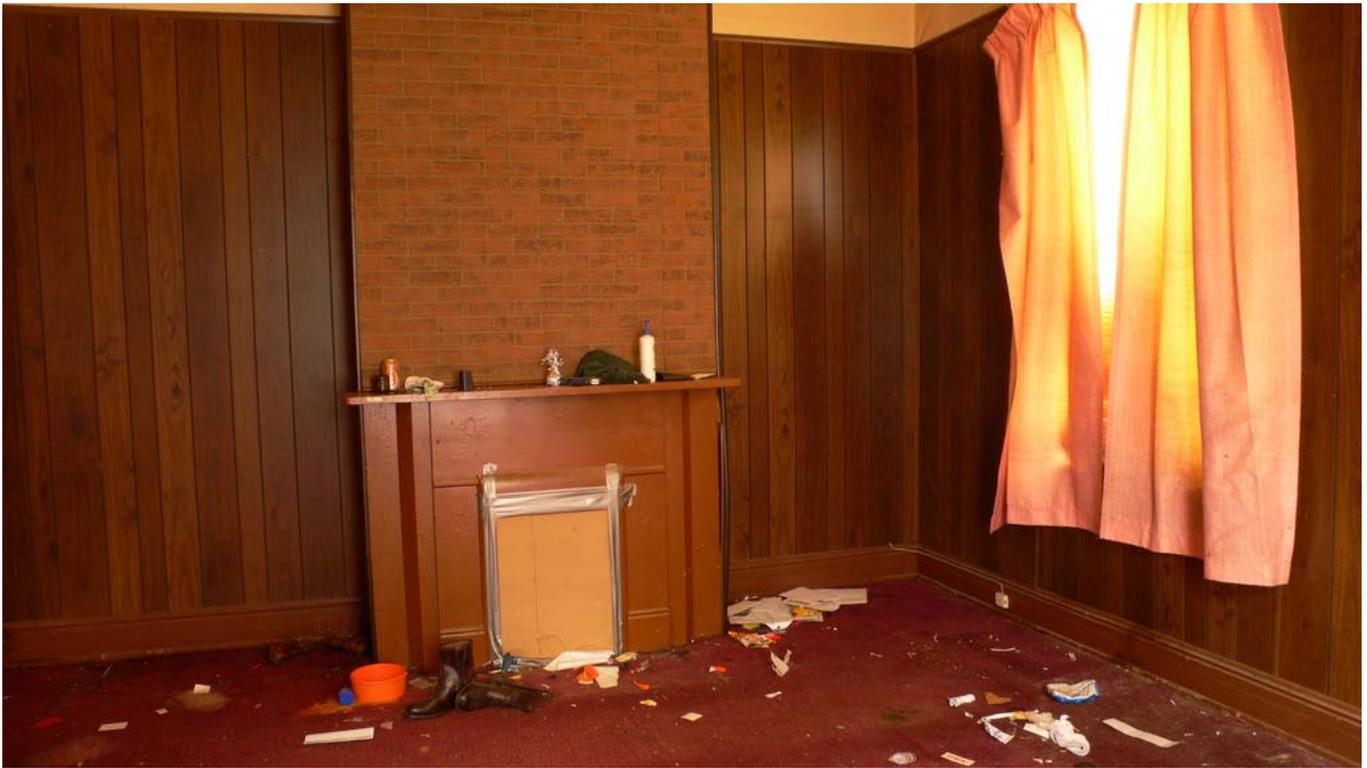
411 West 12th Street, first floor front room, hearth wall.
